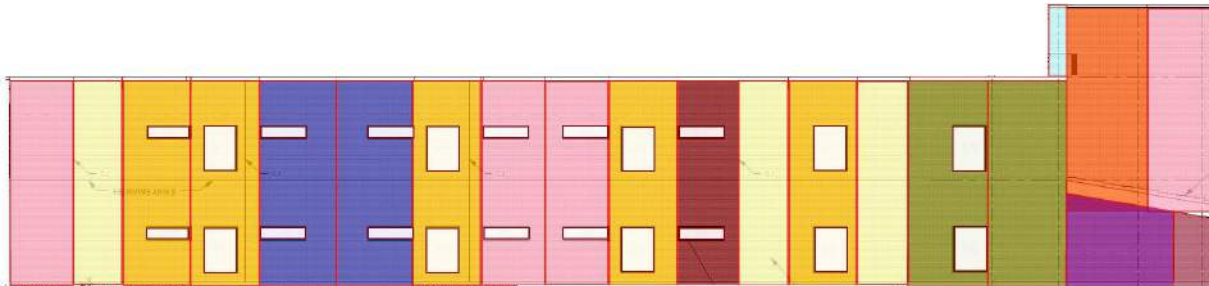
West Elevation Panel Breakdown. Image by George Andonie, modified from Sheet A3.1.2
